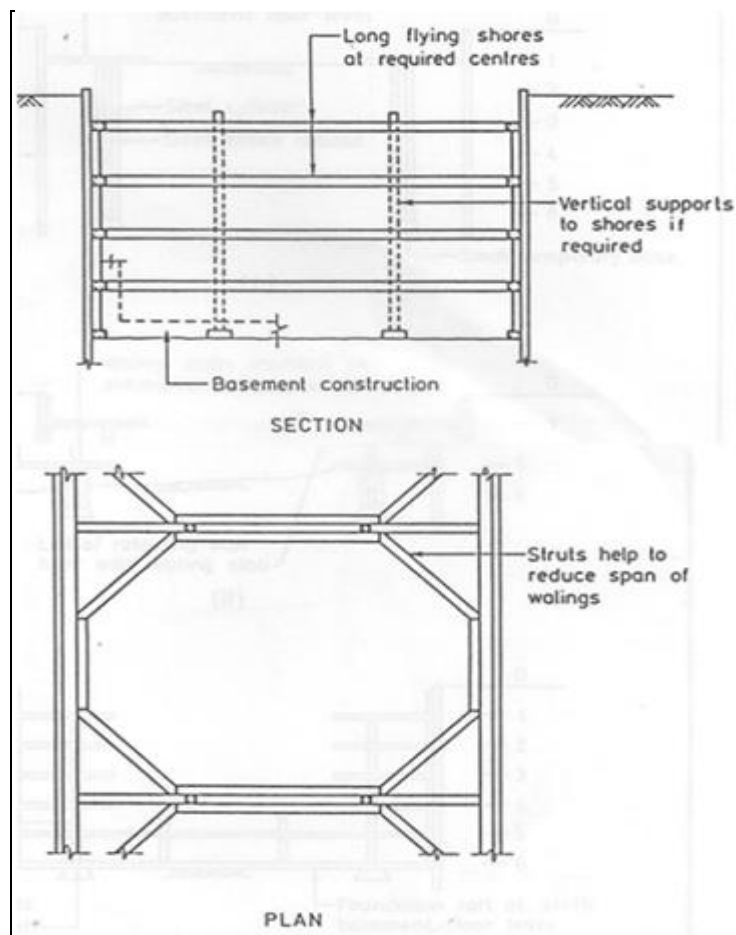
Schematically plan and section for implementing bottom-top method [2]
